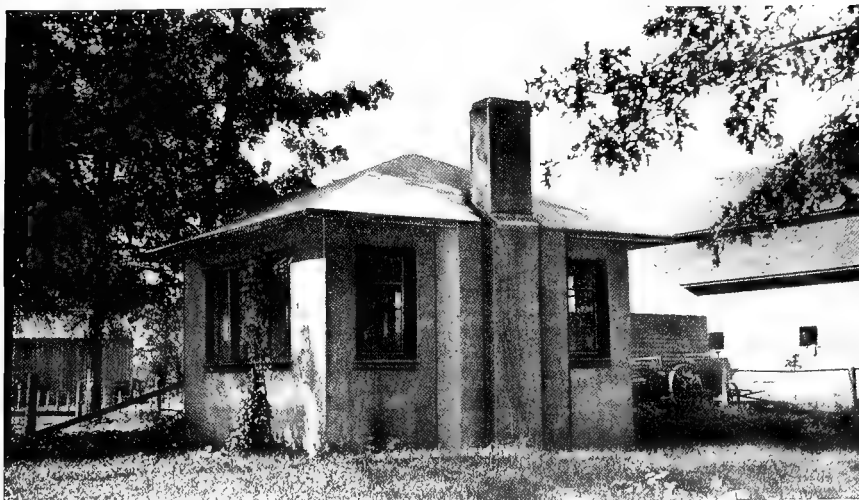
Farm Office Building of Reinforced Monolithic Construction. Morgan Farm, Beloit, Wisconsin. An office building is a great convenience on the modern large farm. Even the roof of this structure is of concrete.
